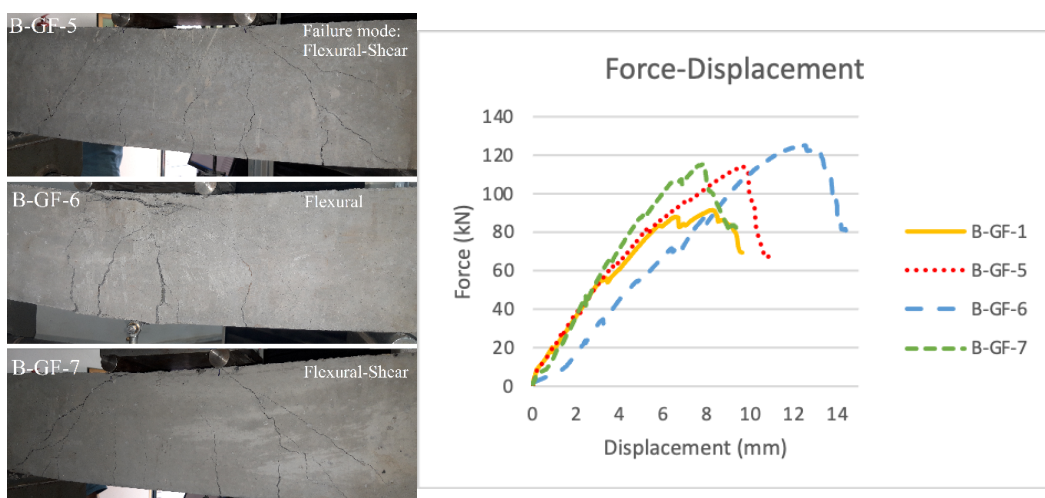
Beams reinforced with GFRP rebars with concrete mixing plans 5, 6, and 7 under bending test.
